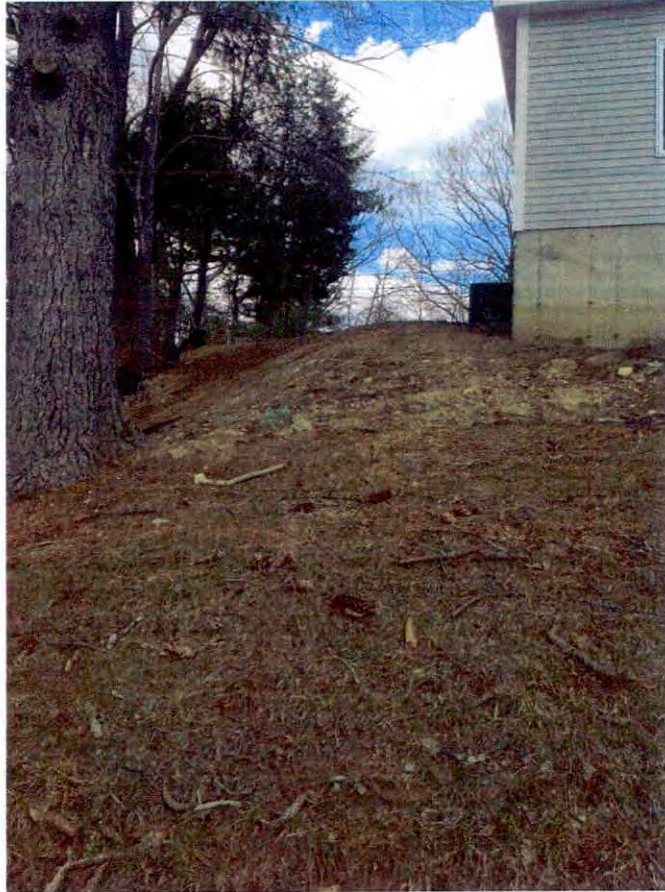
View looking east towards the northern end of the house. Infiltration steps are proposed to provide access to the back yard and to enhance infiltration and provide stormwater management.
